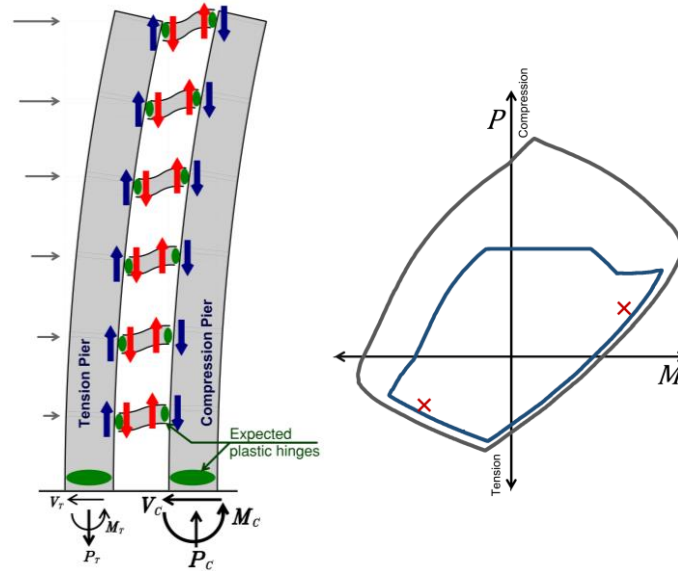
coupled wall internal forces and wall piers P-M diagram.
